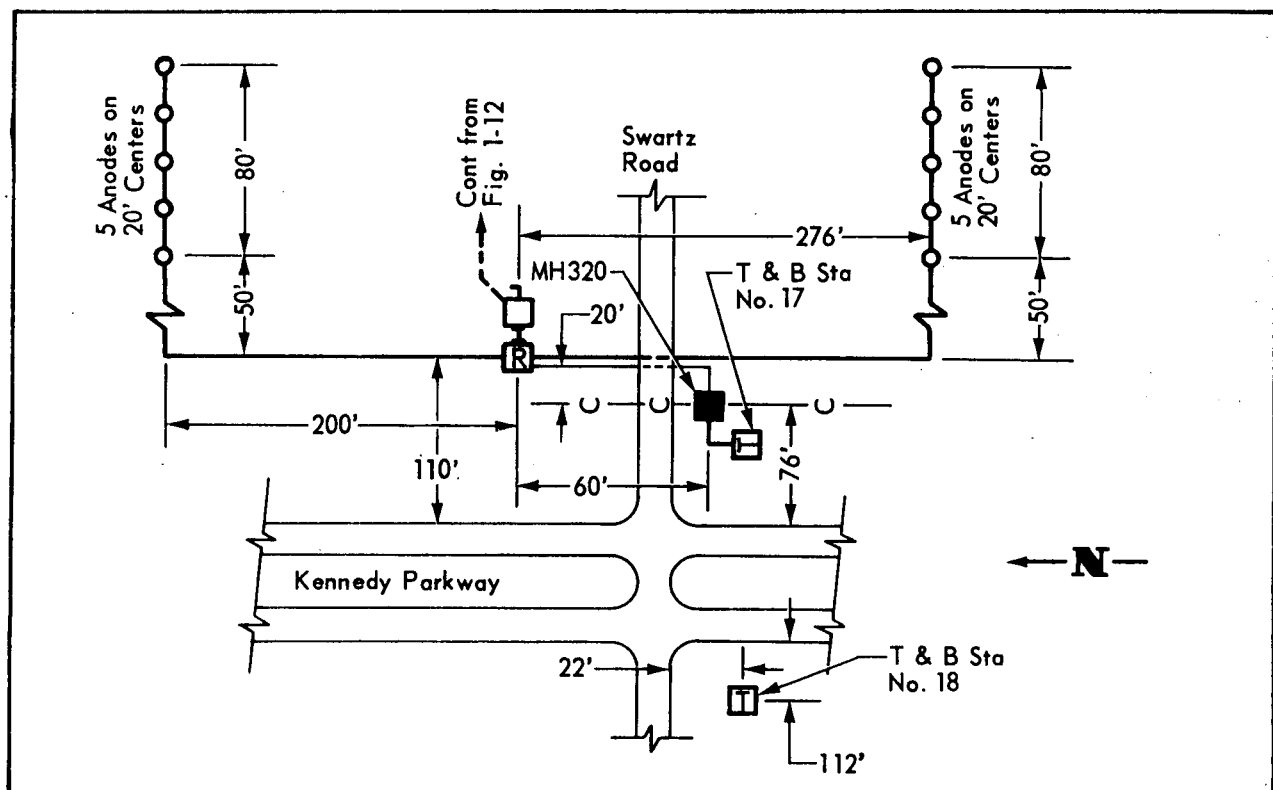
Site No. 12 and Test and Bond Stations No. 17 and 18 Equipment Locator
